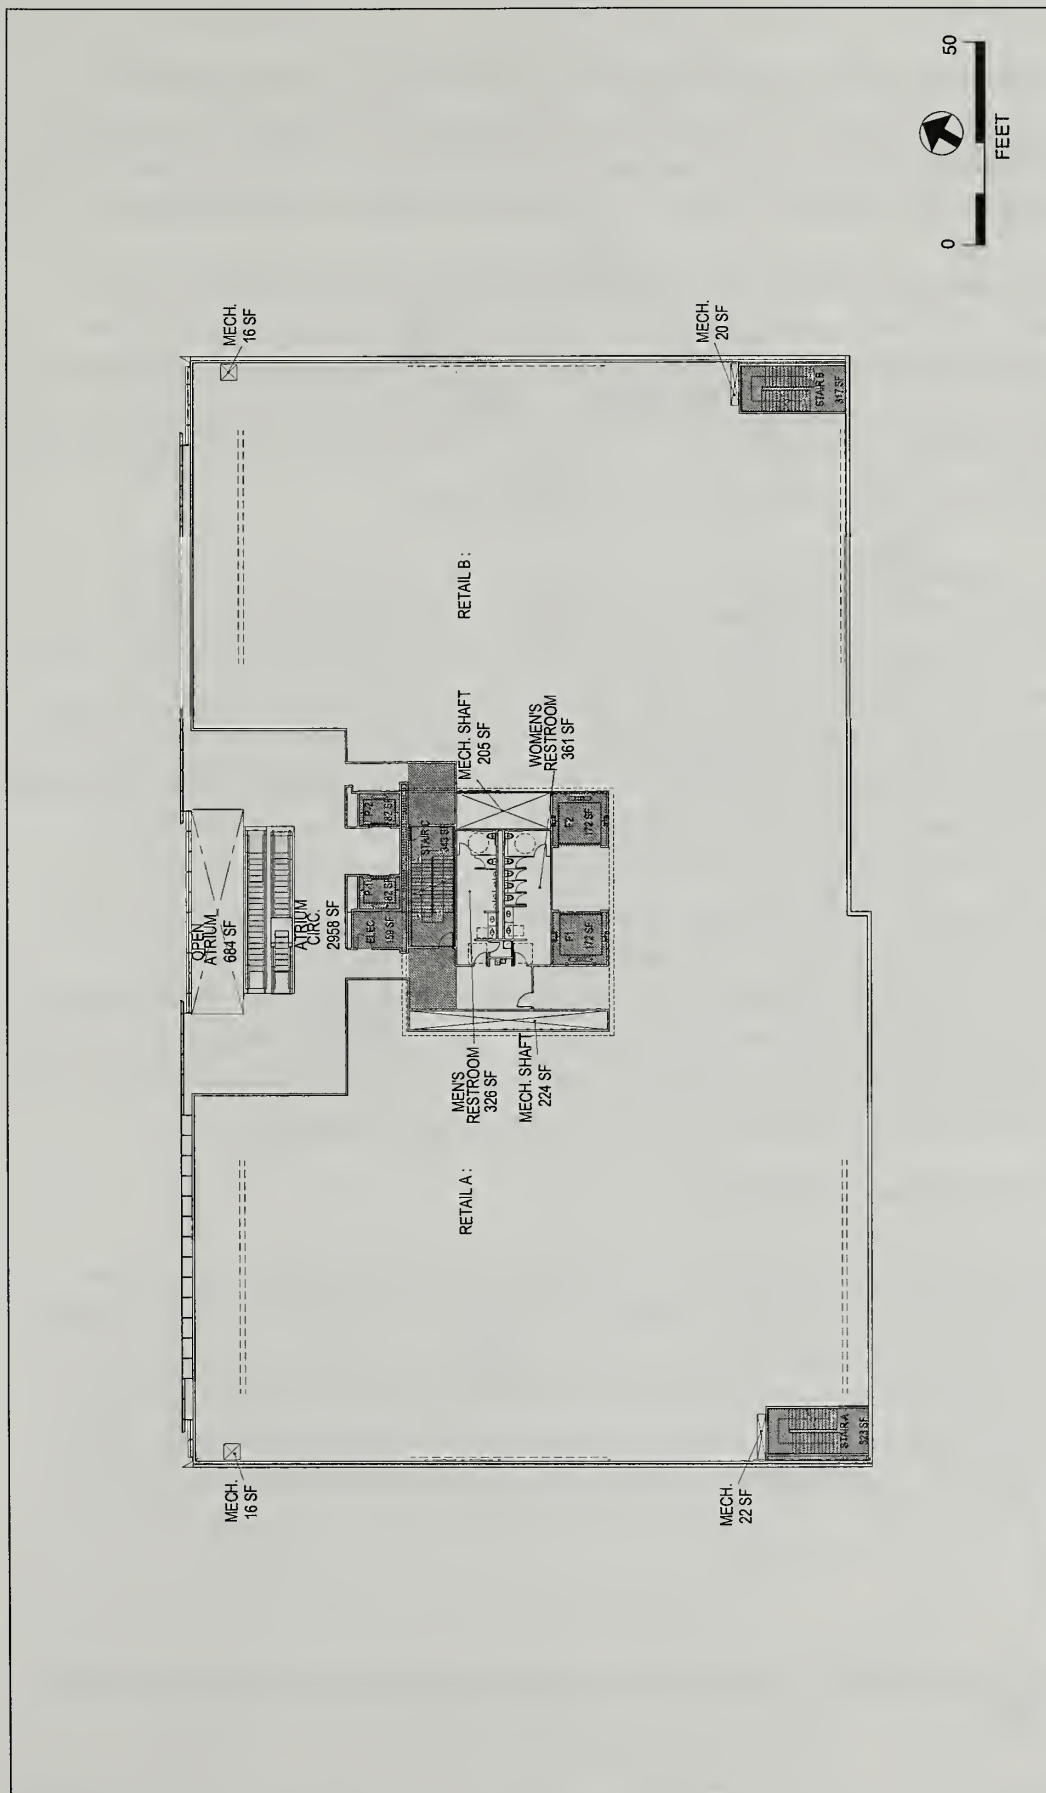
PROPOSED TYPICAL RETAIL FLOOR PLAN
